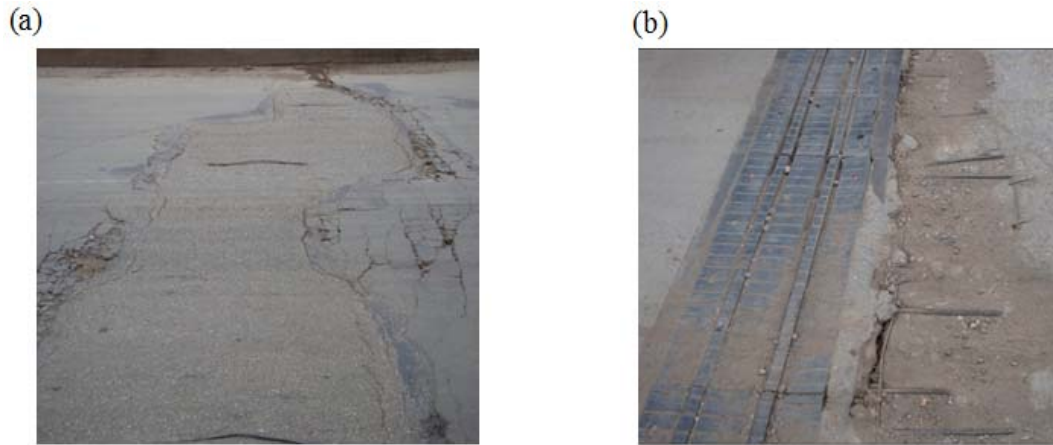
Deterioration of bridge road surface: (a) bridge deck and (b) bridge joint
